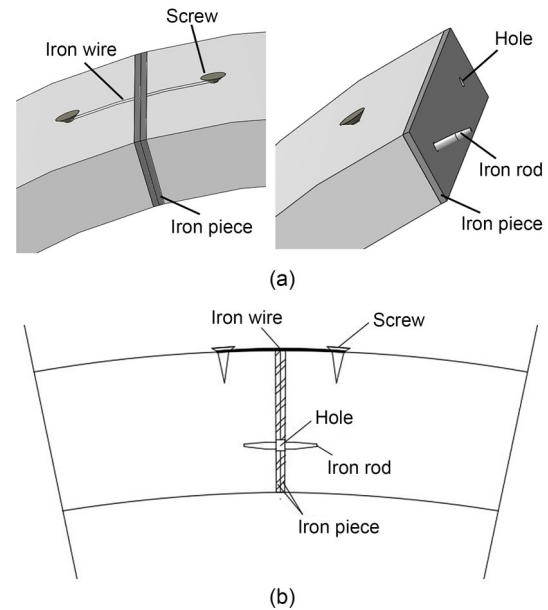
Detailed illustration of the circumferential joint: (a) 3D view; (b) cross-sectional view
